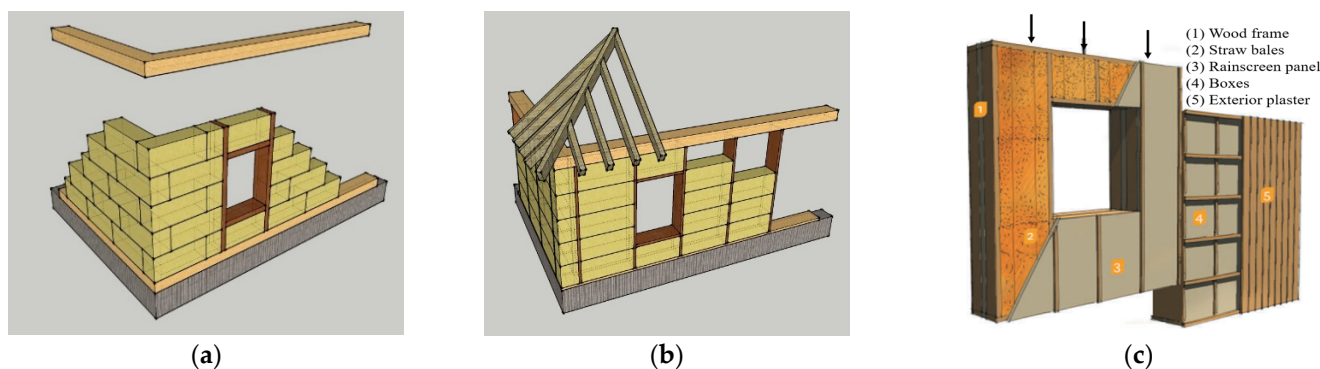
(a) Load-bearing, (b) nonstructural, and (c) prefabricated straw building construction techniques (based on [28,59]).
